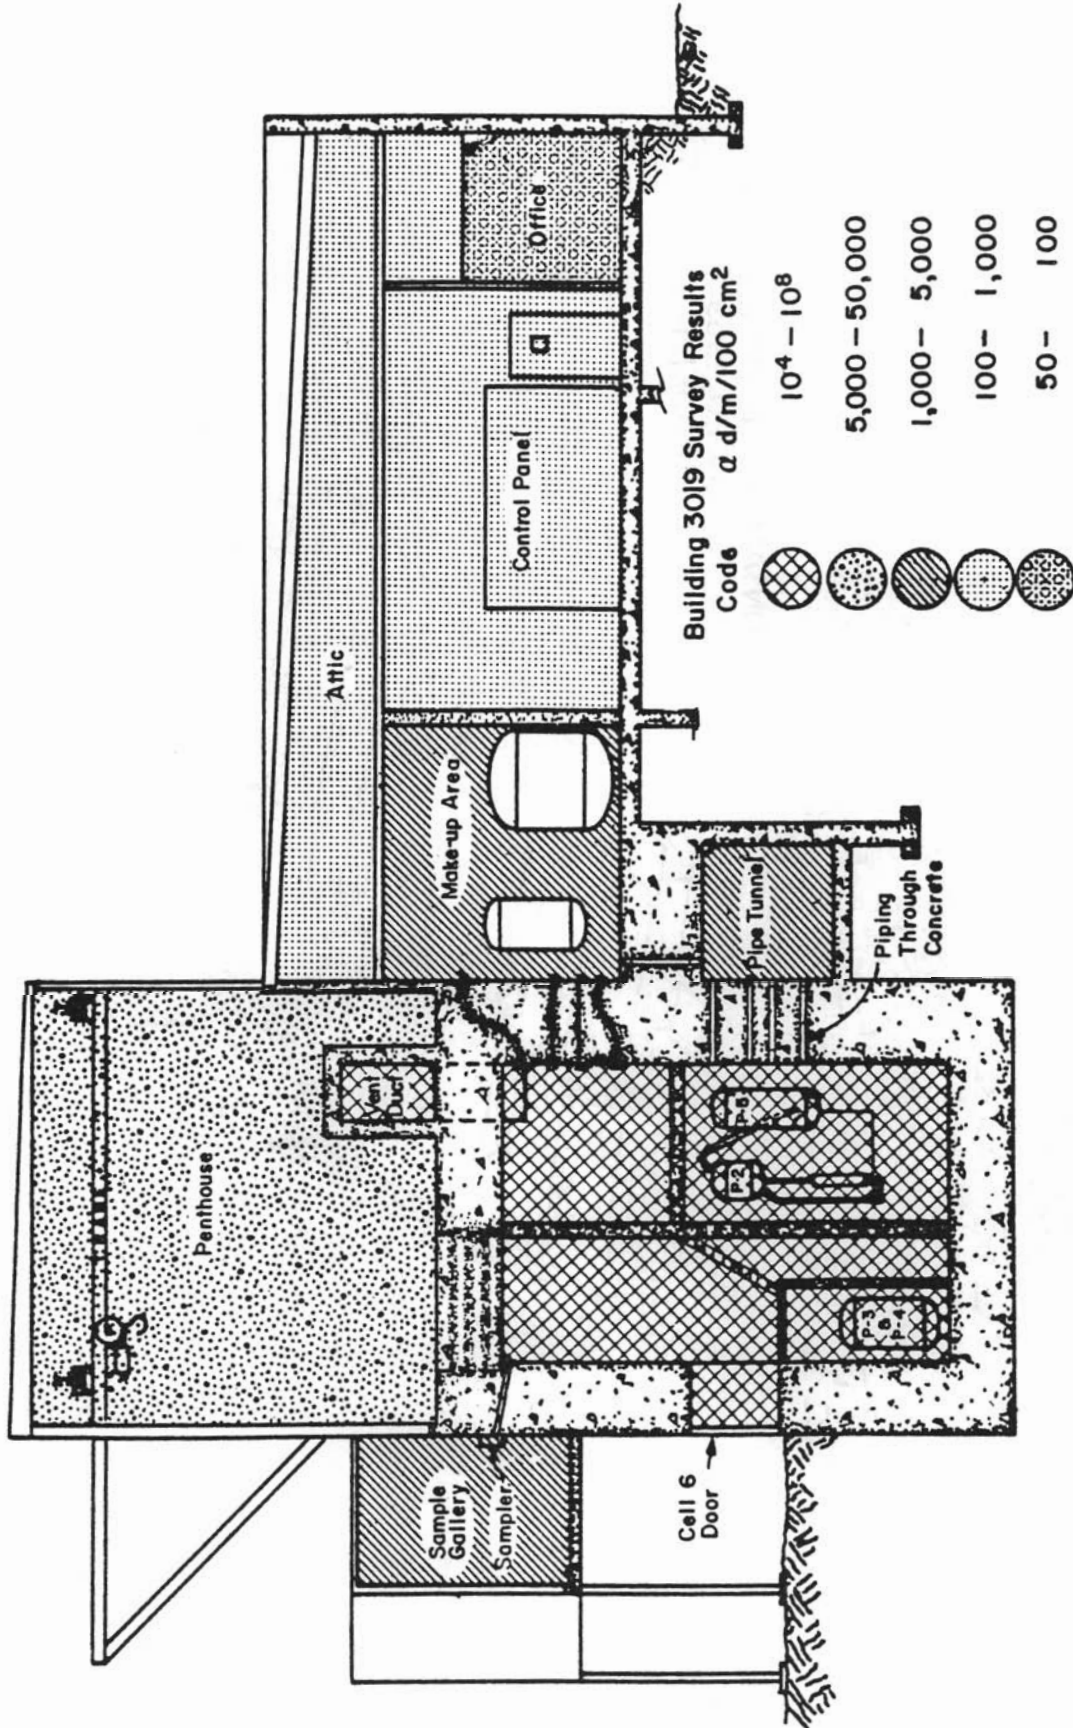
Building 3019 Cross Section Showing Contamination Levels
